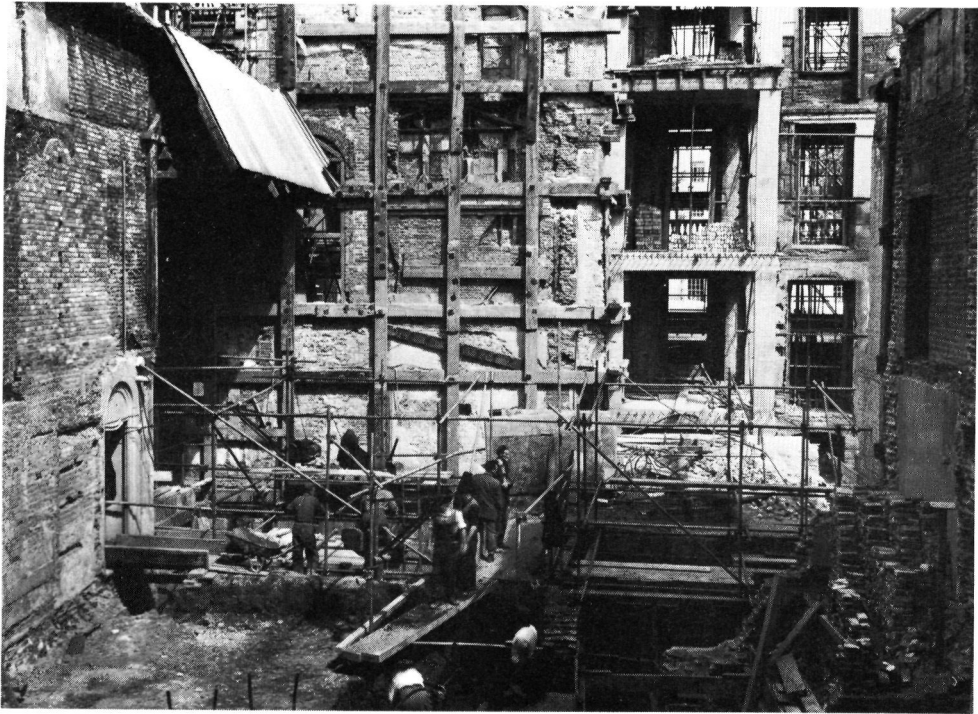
Whitehall: Great Close Tennis Play, elevation of west wall II.T.4 (Crown Copyright)
